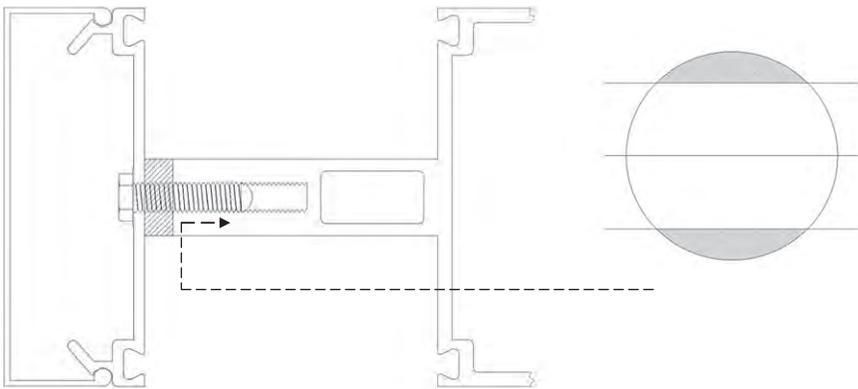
Left: Plan view of a pressure plate connection assembly; right: Cross-section of screw in chase, illustrating thread engagement
